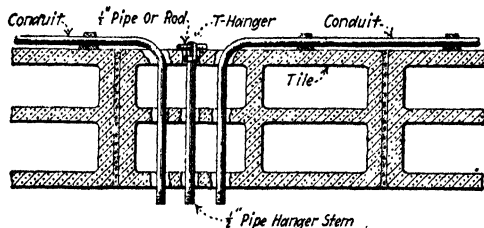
Second step, conduit bent and fitted into place and T hanger in position.
